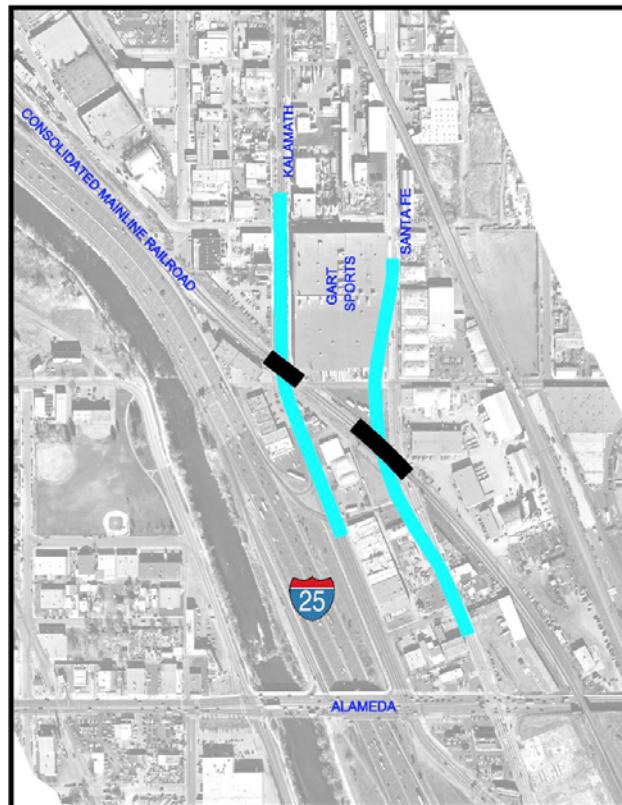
Preferred Alternative, Santa Fe Drive and Kalamath Street Grade Separation
